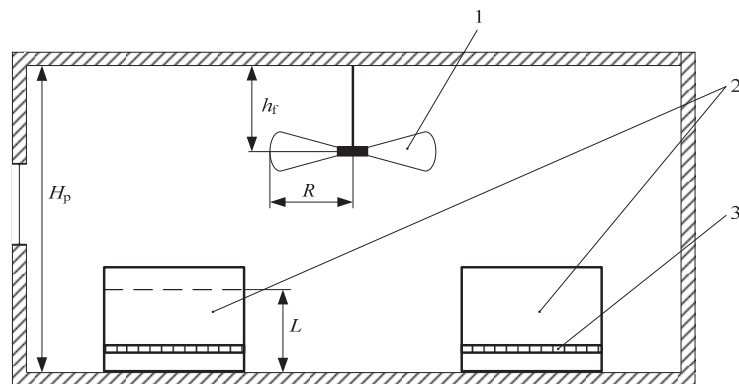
Diagram for optimal ceiling fan installation: 1—ceiling fan; 2—cages for calves; 3—slatted floor of the cage.
